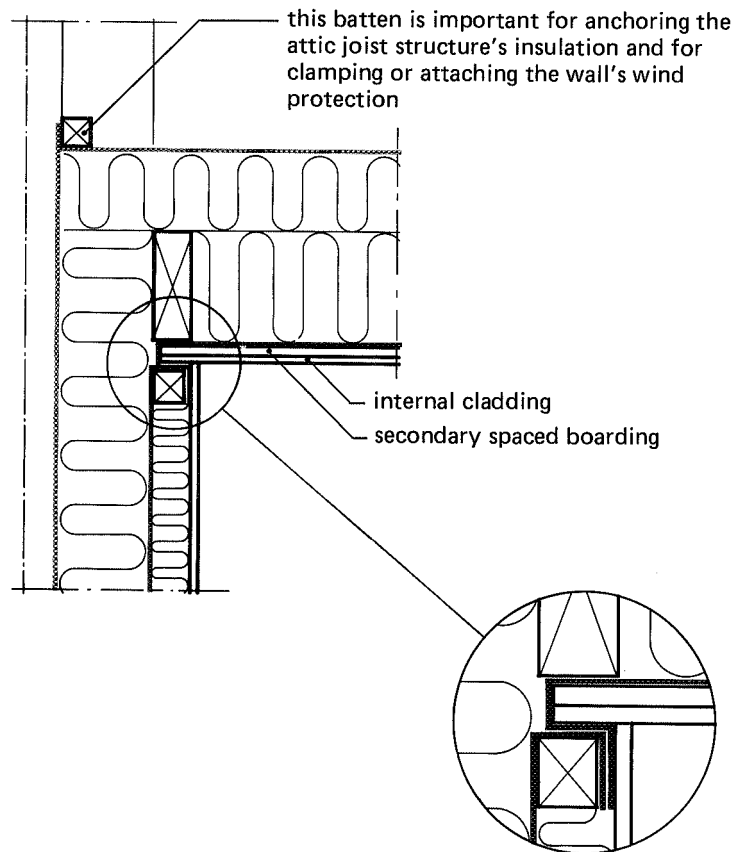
Jointing gable heads and roof trusses in dormer houses. The same solution can be used for jointing gable walls and attic joist structures in 1- and 2-floor houses as well. The foil in the joist structure is fitted before the foil in the wall. The overlap from the ceiling must be attached temporarily against the ceiling whereas the wall construction is supplemented with foil, internal horizontal members etc. The foils are folded down so that overlap and clamped seals are obtained when the internal sheet cladding is fitted.
